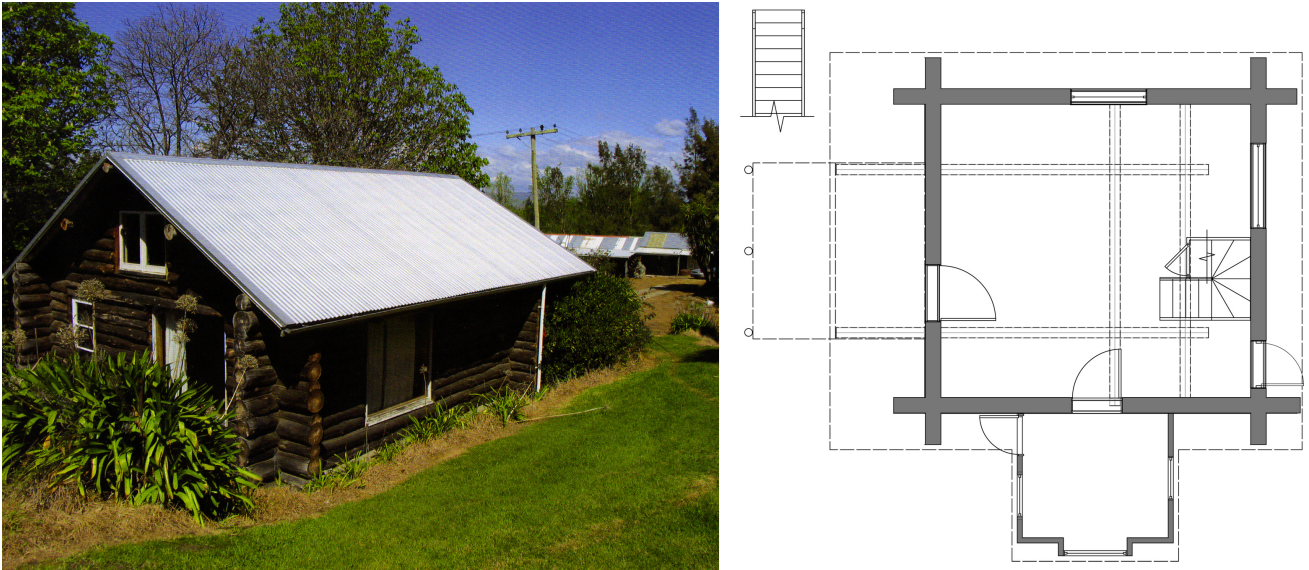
The LC before renovations: A view from the northwest (left) and the ground floor plan (right).
